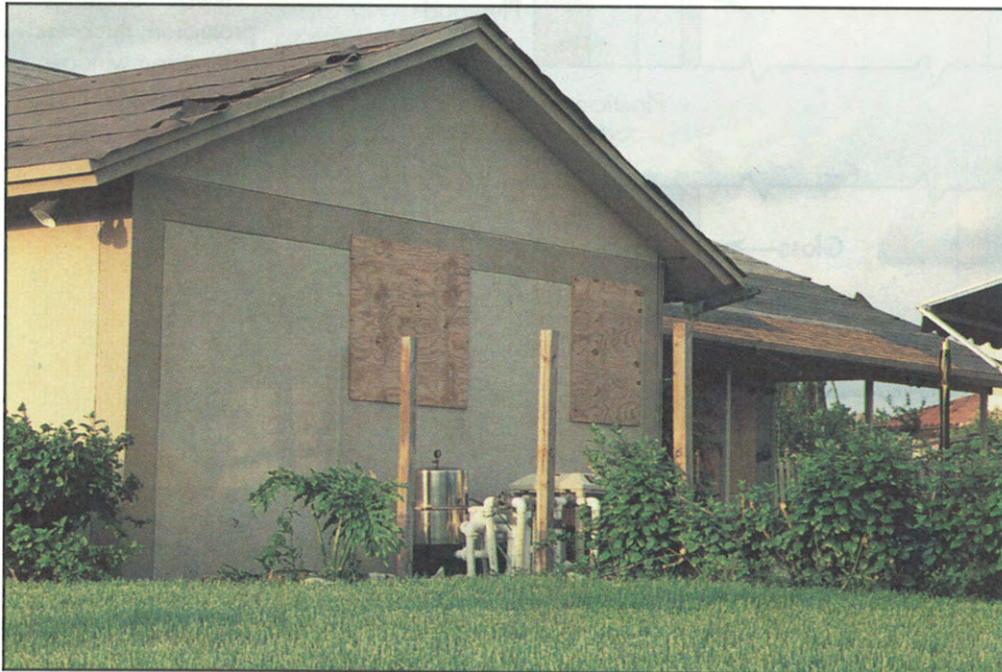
Plywood used as openings protection installed. See Figure 91 for details.
